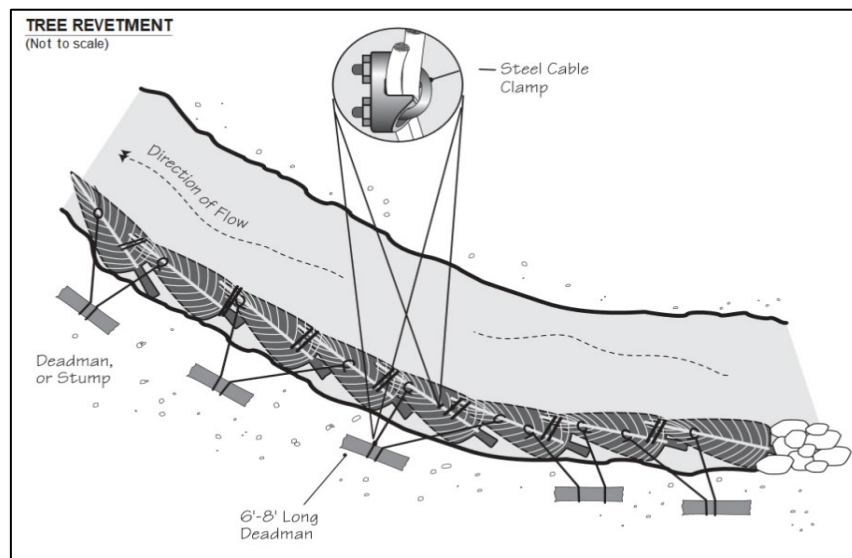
Plan View of Tree Revetment (Eubanks & Meadows, 2002)
